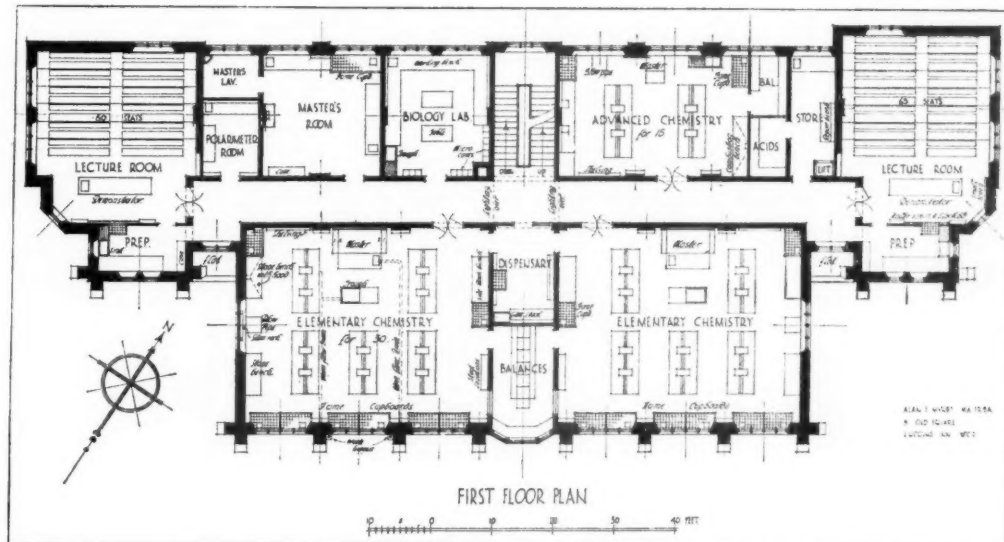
CLIFTON COLLEGE: FIRST FLOOR PLAN OF CHEMICAL DEPARTMENT
